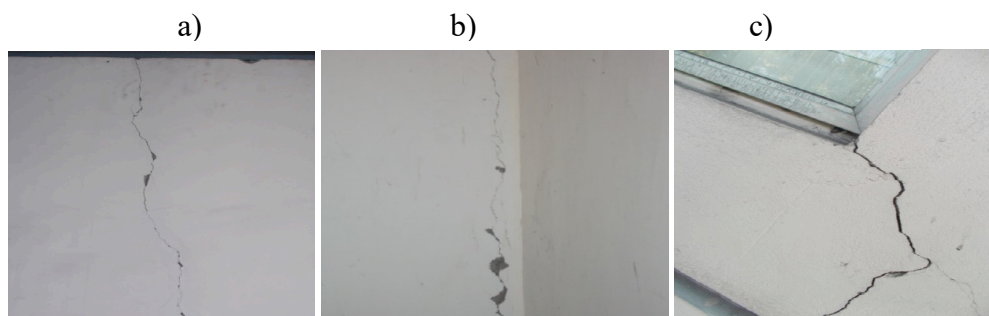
Types of cracks - a) thin crack, b) medium crack and c) wide crack
